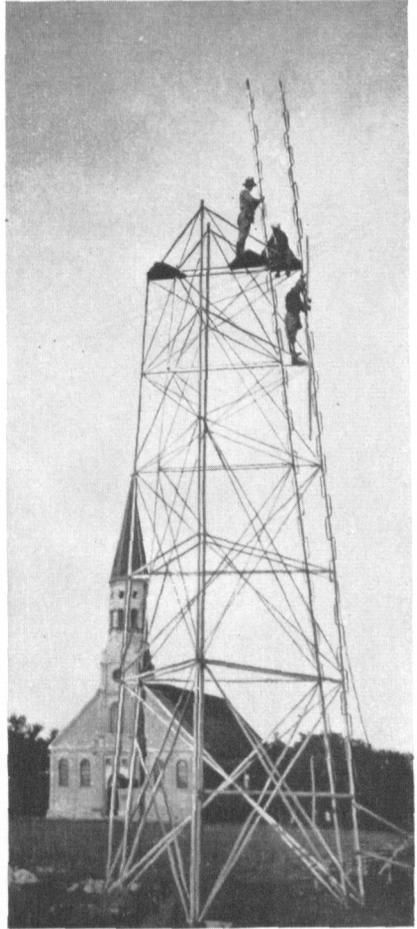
Corner posts being bolted on fourth section of tower.
